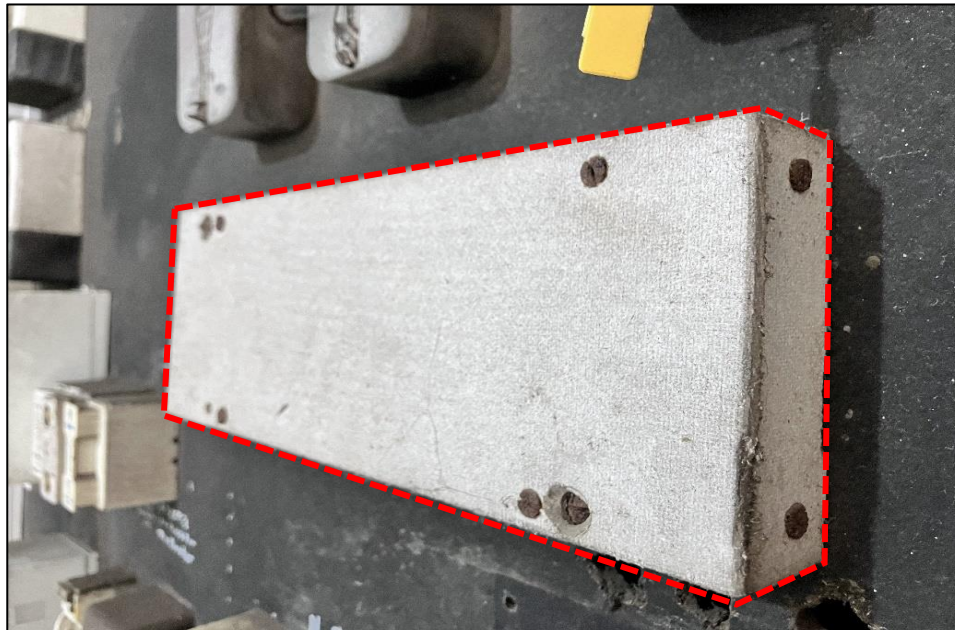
3 Help Street, interior, centre stairwell, ground floor, electrical panel, fibre cement linings, asbestos detected by analysis.
